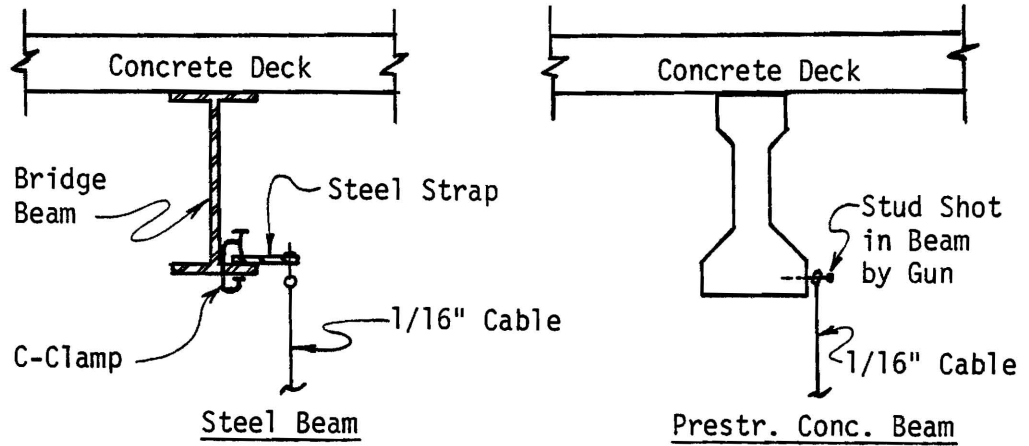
Detail of Attachment of Cable to Bridge Beam.
